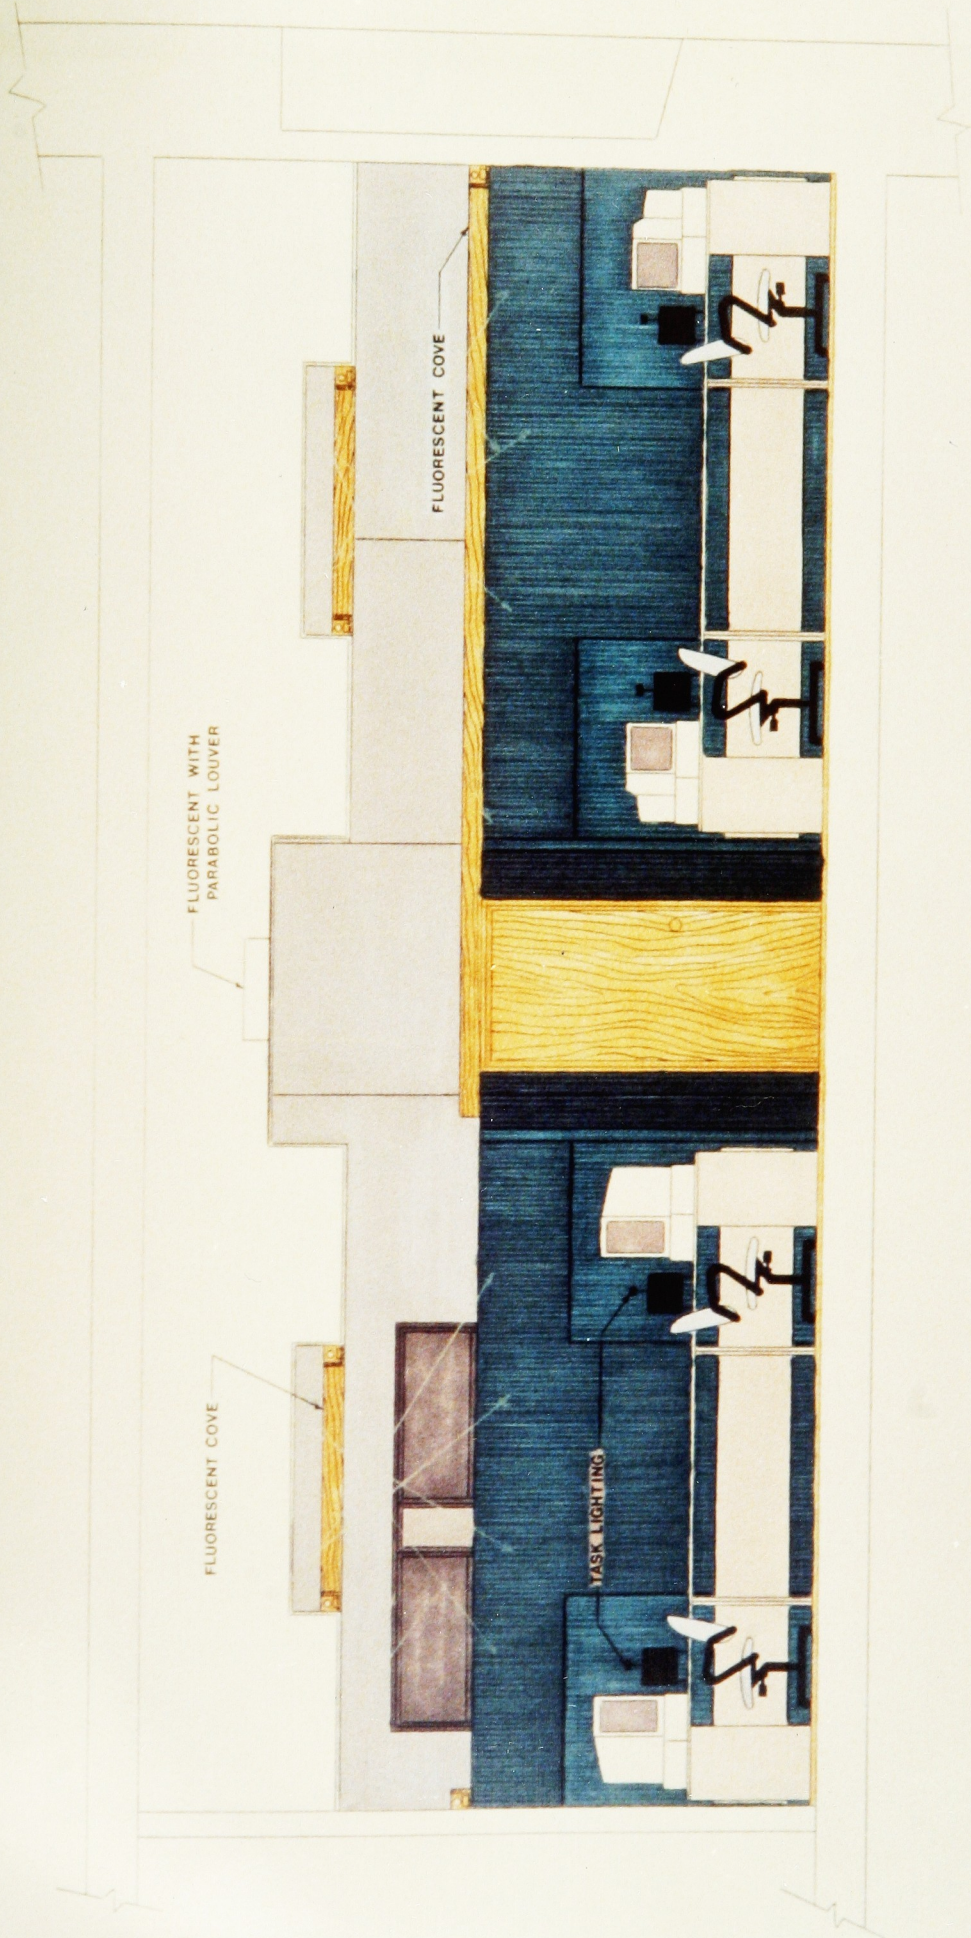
SECTION A-A PROPOSED ROOM 3510
